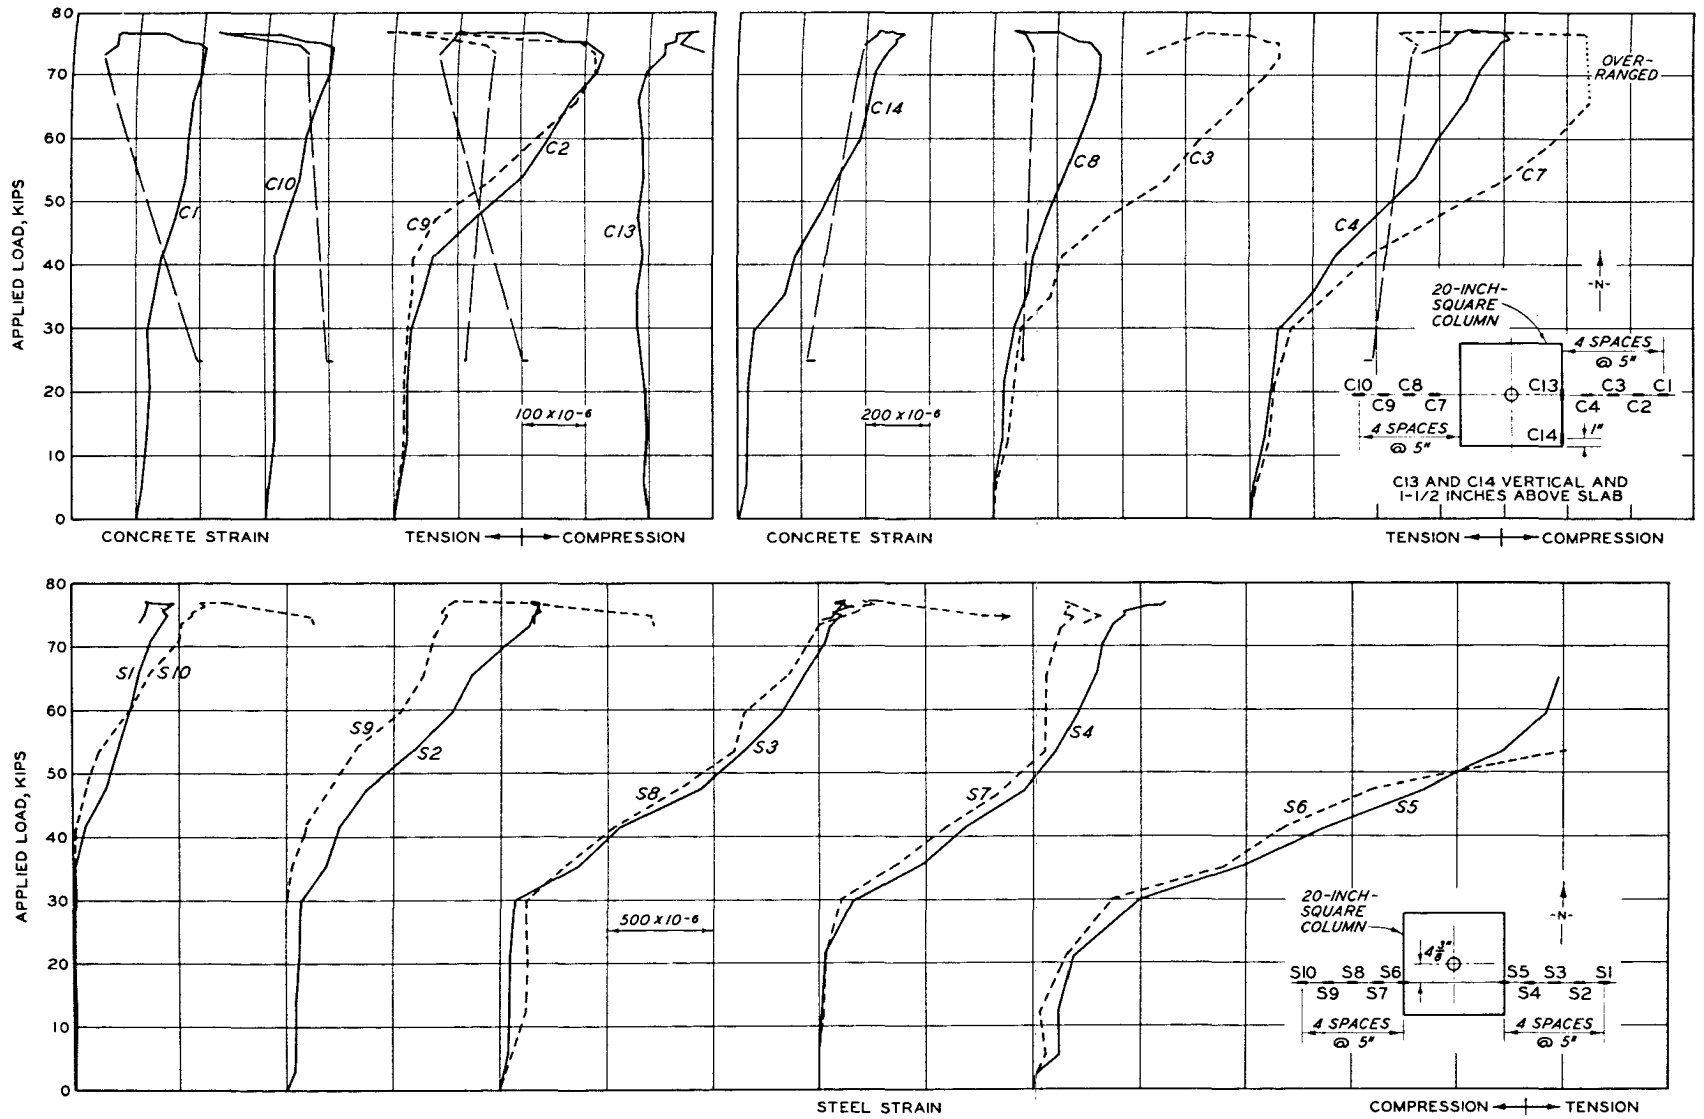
Concrete and steel strains, Specimen S4075-1.
